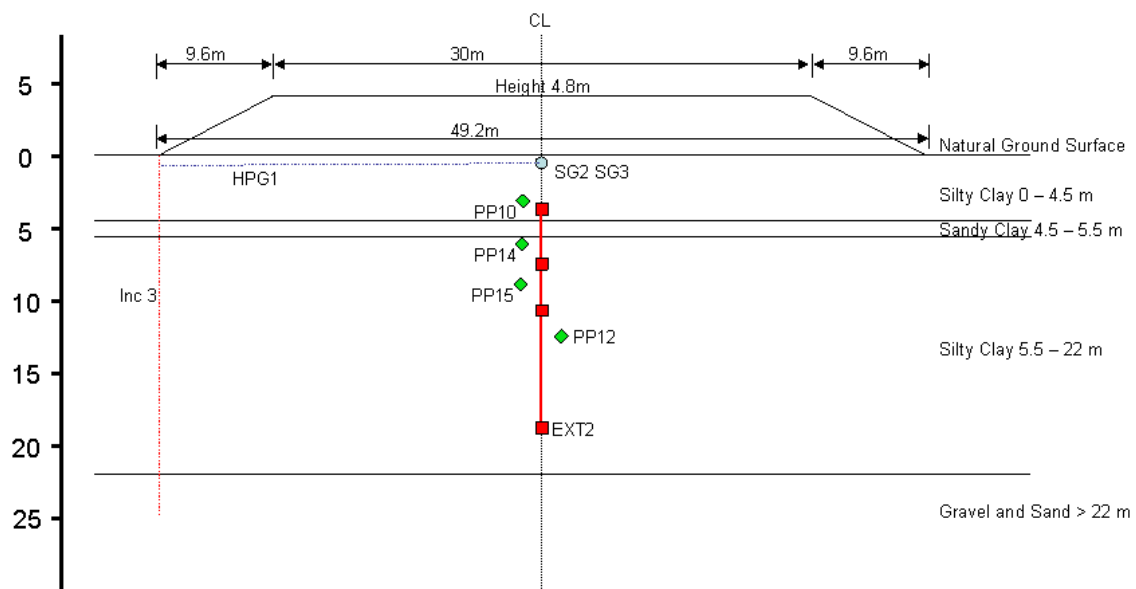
Embankment C CH1107 CH1218: Cross Section Showing Instrumentation
